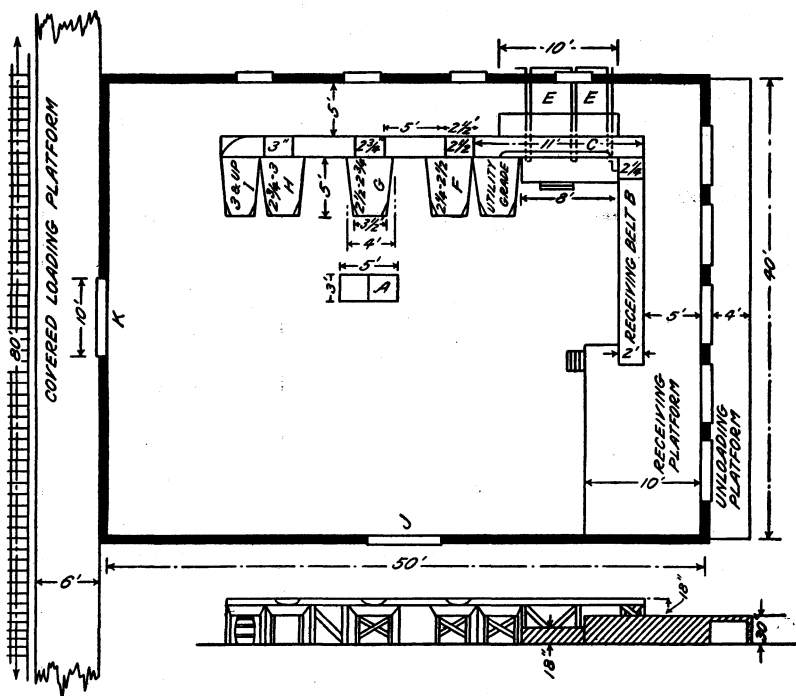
Plan 4: Floor plan of house fully equipped for barrel and basket packing
